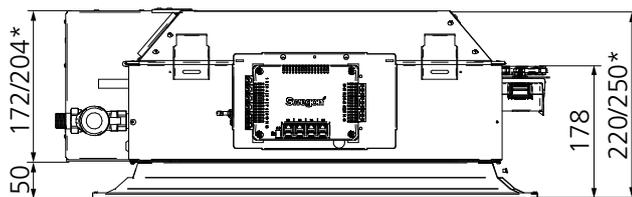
Dimensional drawing, side view. Air connection on the short side.
